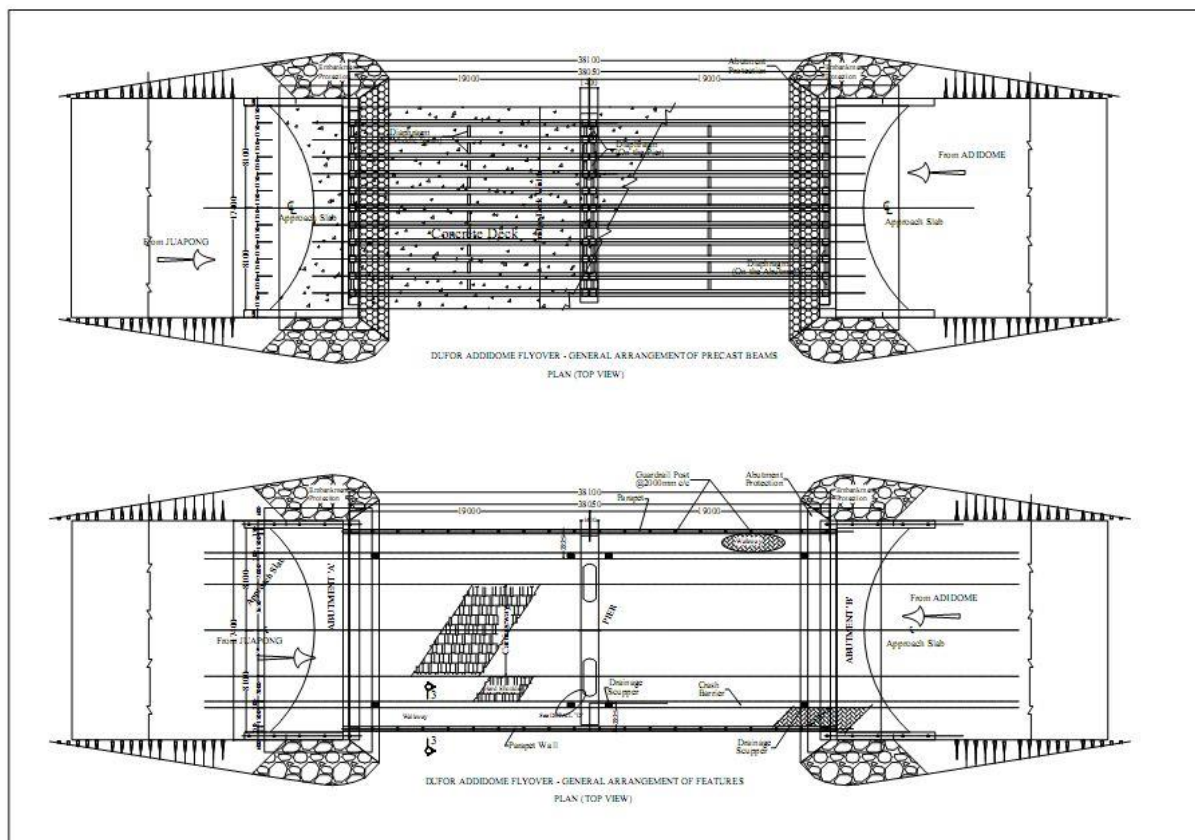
Bridge on Dufor Adidome Interchange CH.29+350 on Section 3 Project Road
